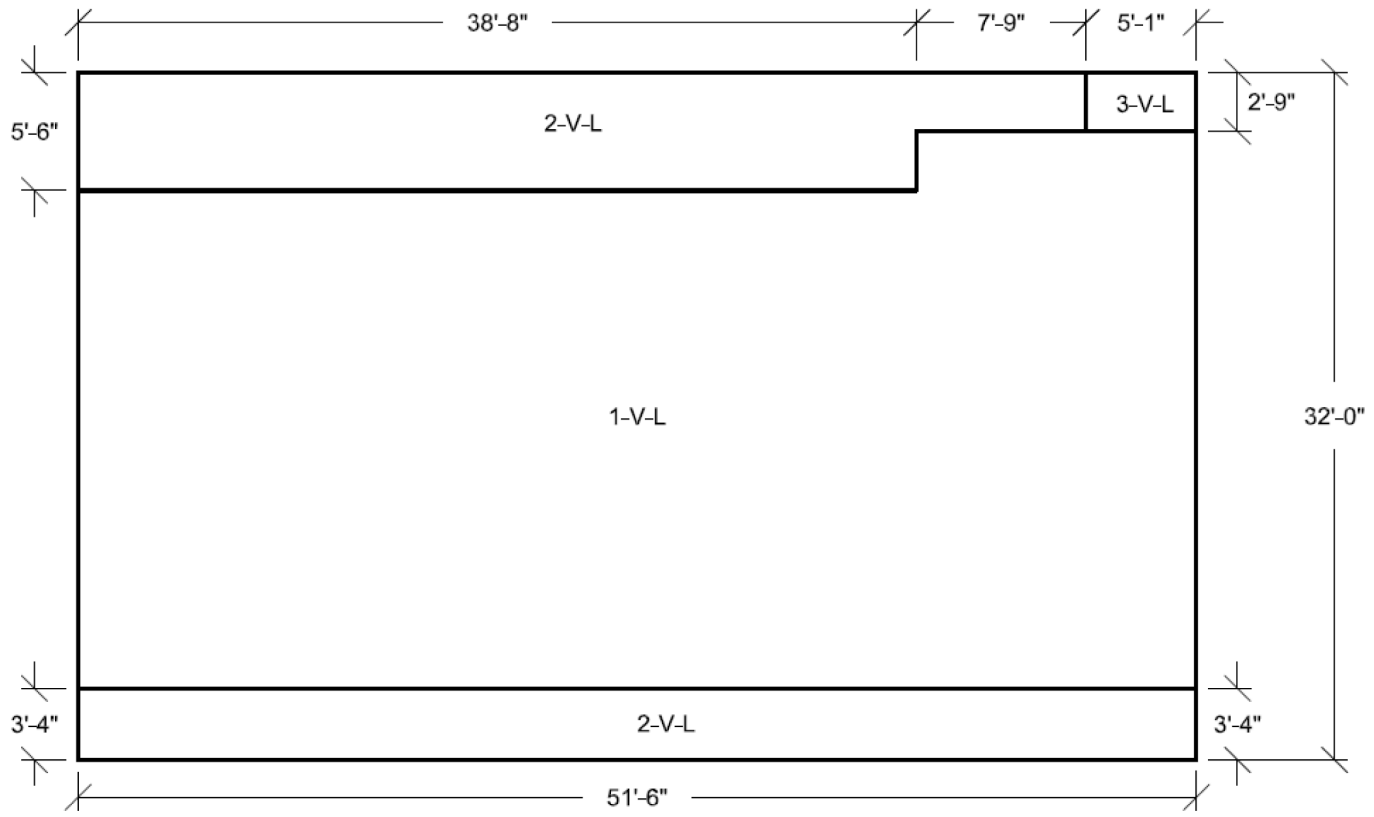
H.6-148 DGFOV Roof 2 Looking Down Vertical Reinforcement Zones Near Side Face
